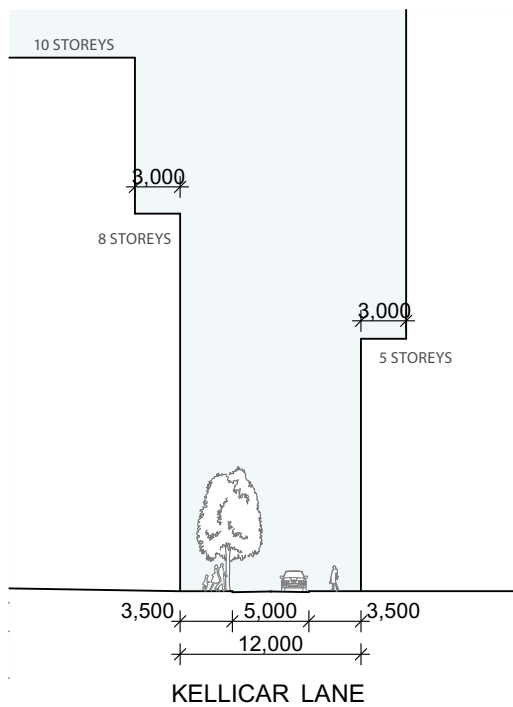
Typical Kellicar Lane Street Section and examples of character showing loading areas, planting and some active frontages - Tanksteam Way and Reiby Place, Sydney
